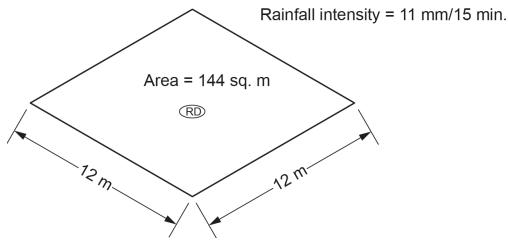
Roof surface 12 m x 12 m. (Skilled Trades BC, 2021) Used with permission.
